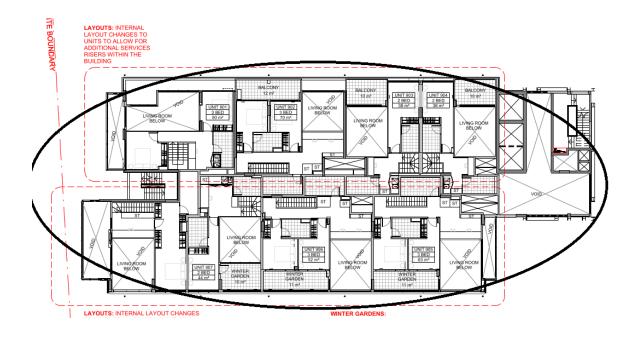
Proposed modification to the Mezzanine Level – comprising changes to the balconies along the Church Street and Well Street elevations
